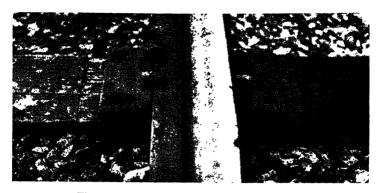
Section 28, 13-in. Wool Felt Tie Pad.
